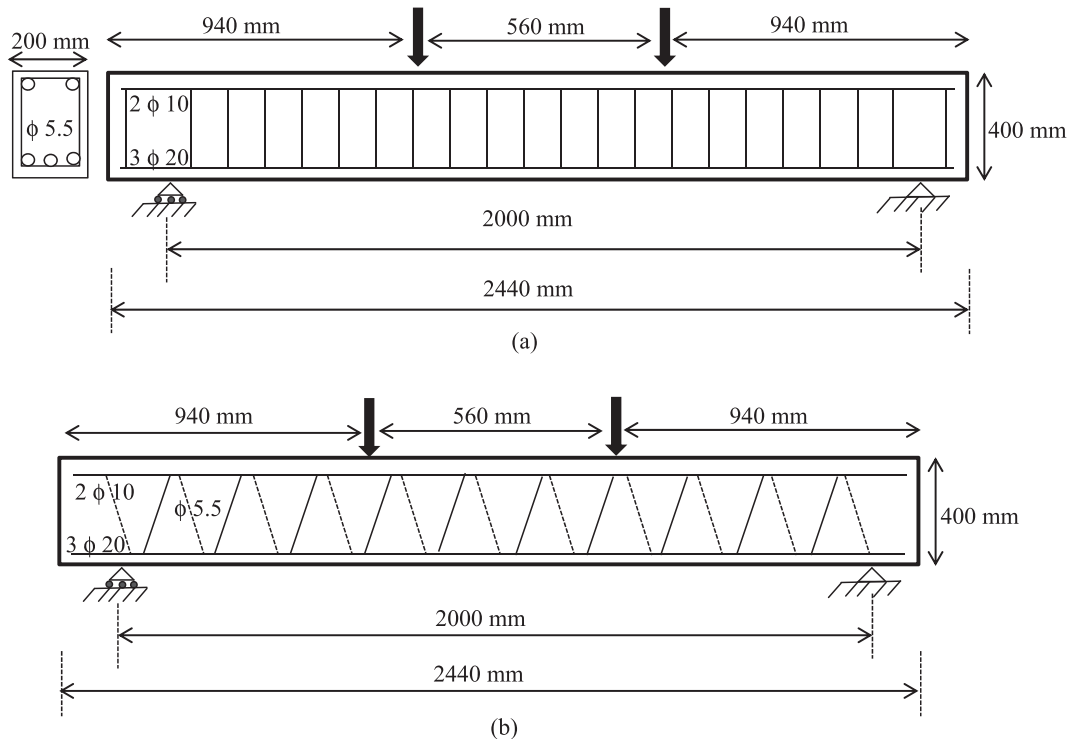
(a) Beam details using single stirrups; (b) Beam details using rectangular spiral reinforcement.
